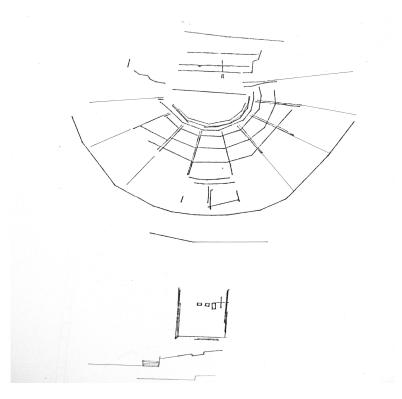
Plan layout of theatre and temple (Archeological excavation reports)
